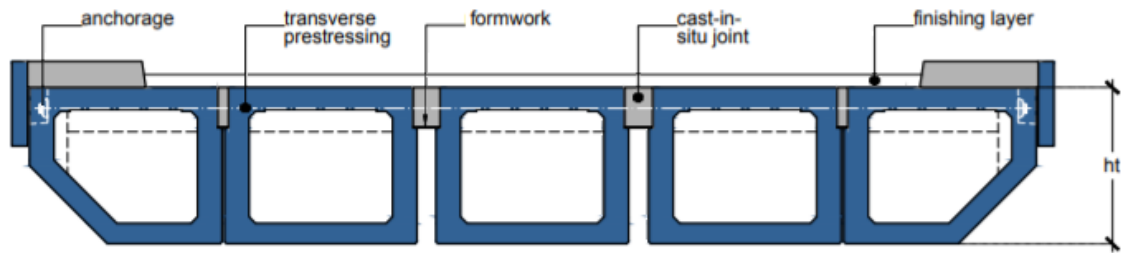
Cross-section of a box beam (SKK) deck [78] (adapted)
